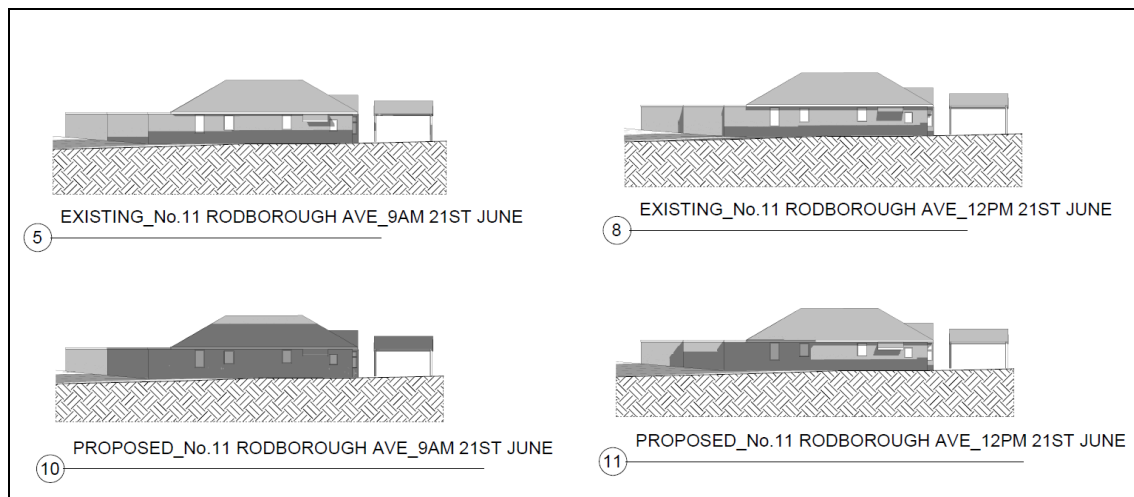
Elevational solar impact to 11 Rodborough Avenue, Crows Nest
